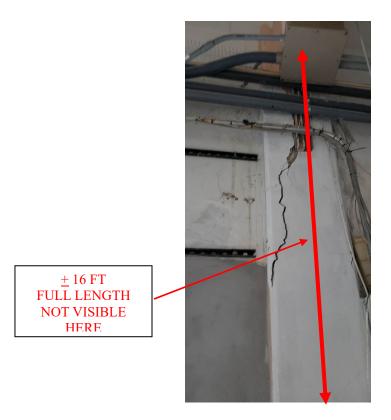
Interior of the Building. Location 4: Approximately 16 ft long new 16x16 concrete column. See detail 1/S101.
